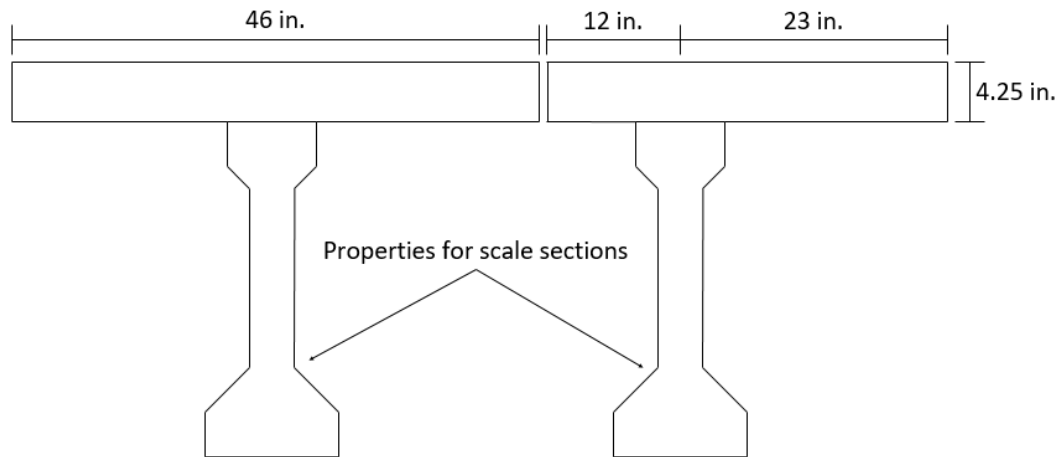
Longitudinal members used in grillage: interior girder (left), exterior girder (right)
